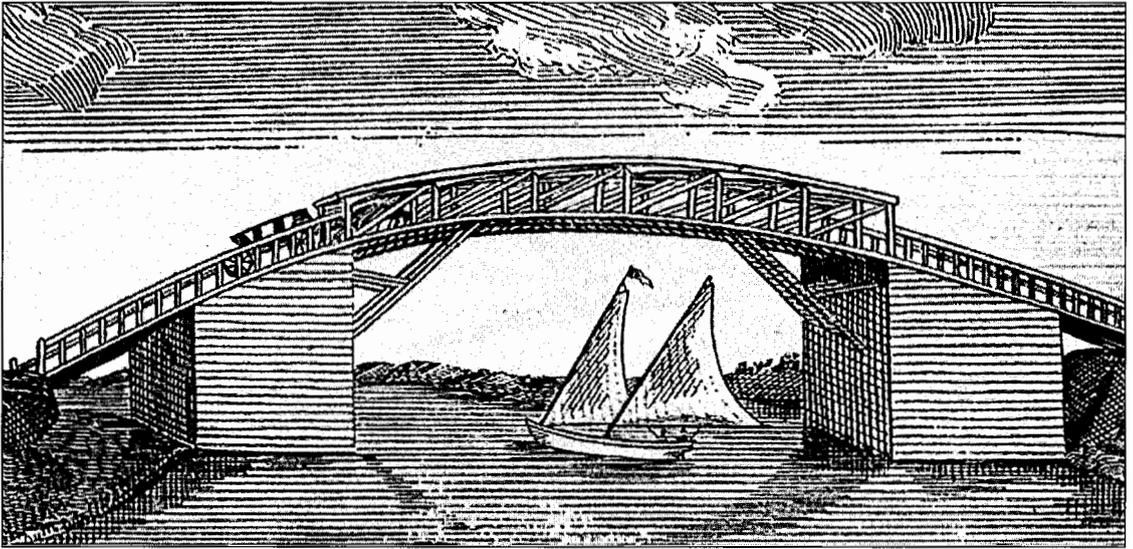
Drayton's sketch of the Newburyport Bridge.
